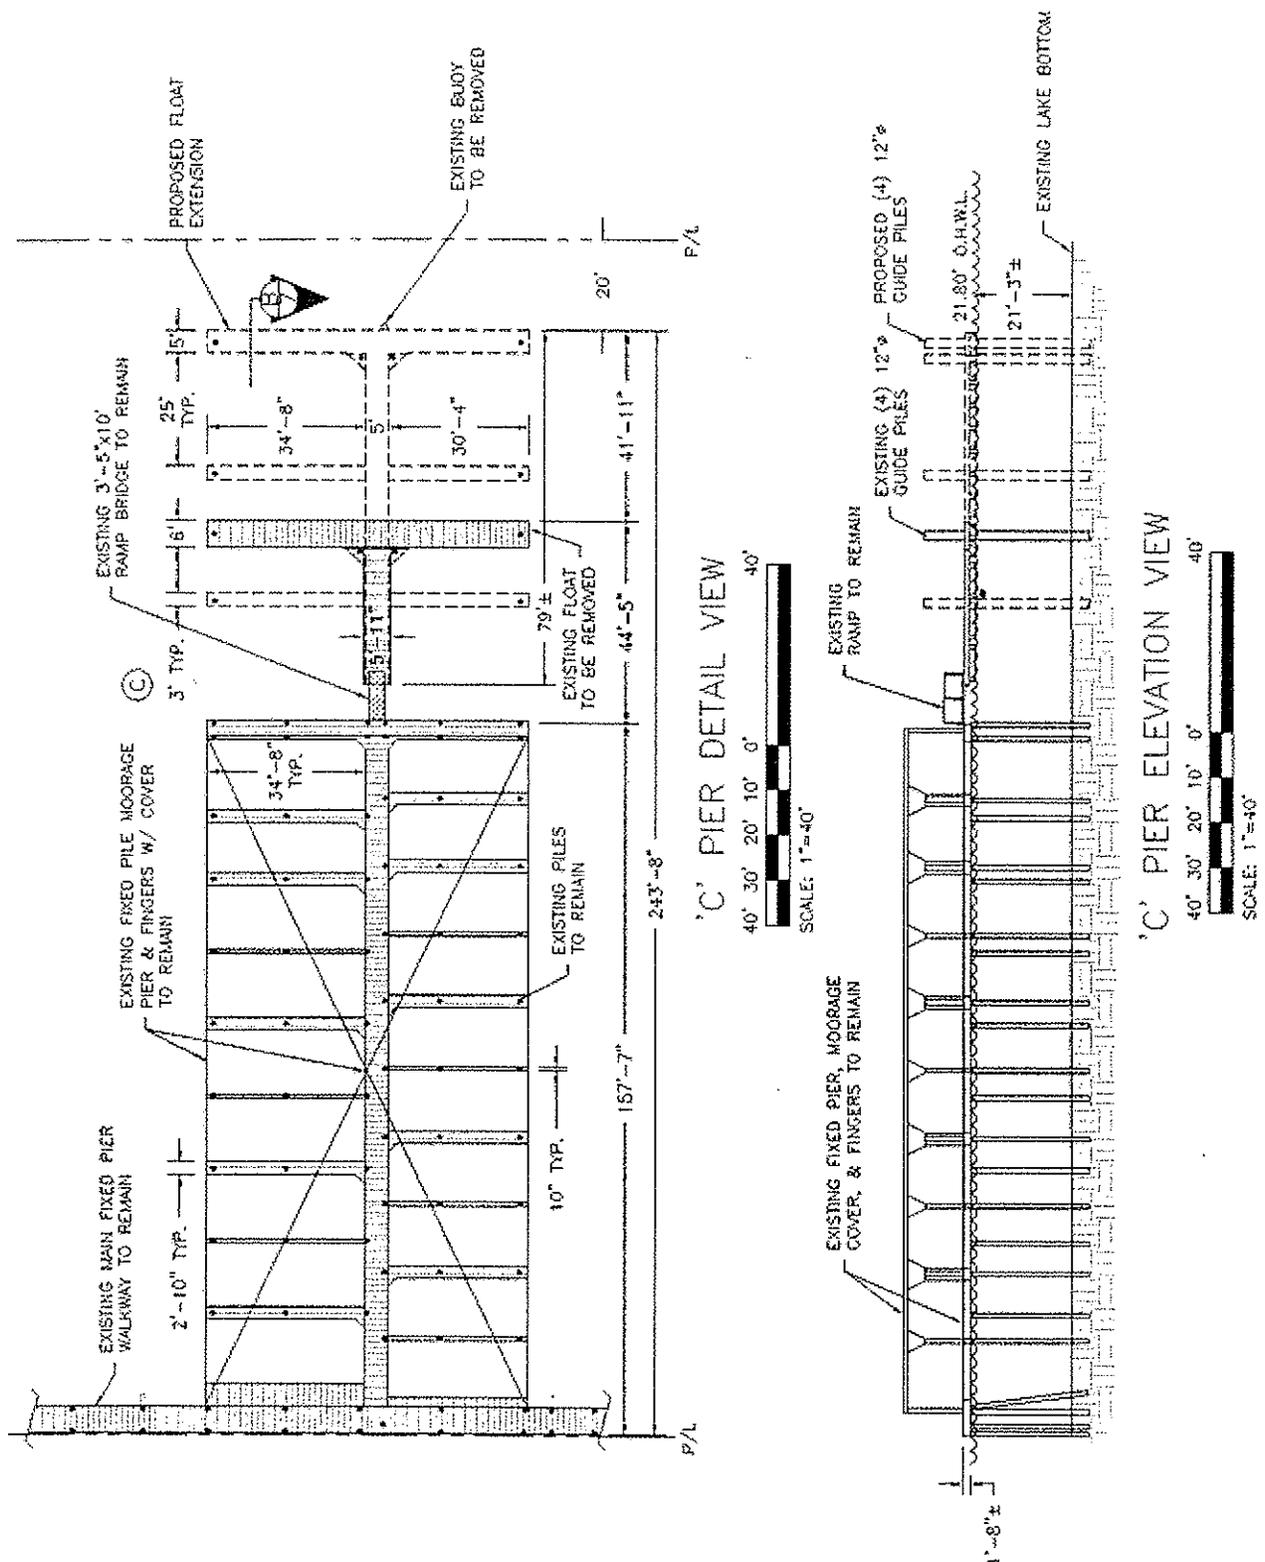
Plan and elevation views of the existing and proposed Pier C (prepared by Waterfront Construction Inc.).
